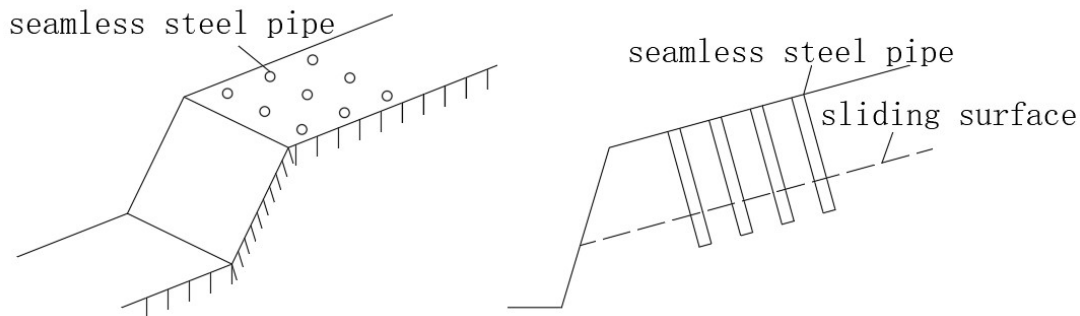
Schematic Diagram of Split Grouting Steel Anchor Pipe Model Test
